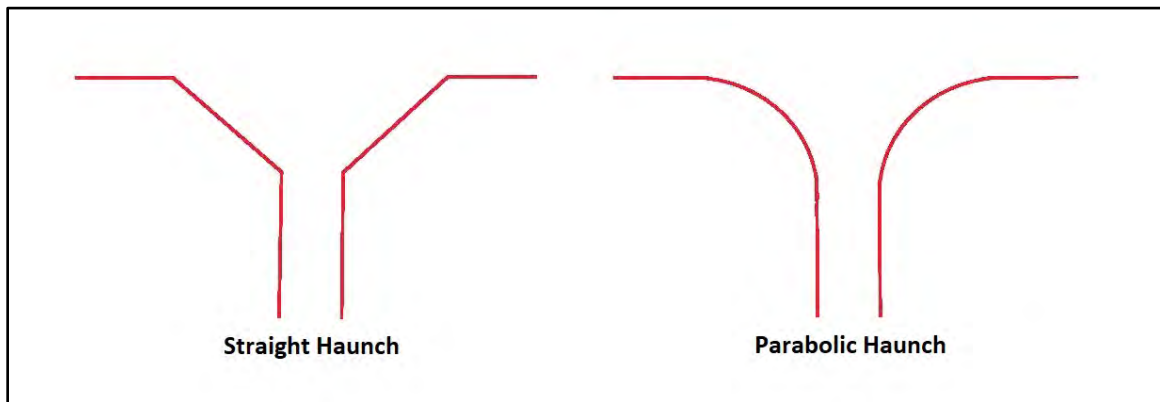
A Straight Haunch versus a Parabolic Haunch.
